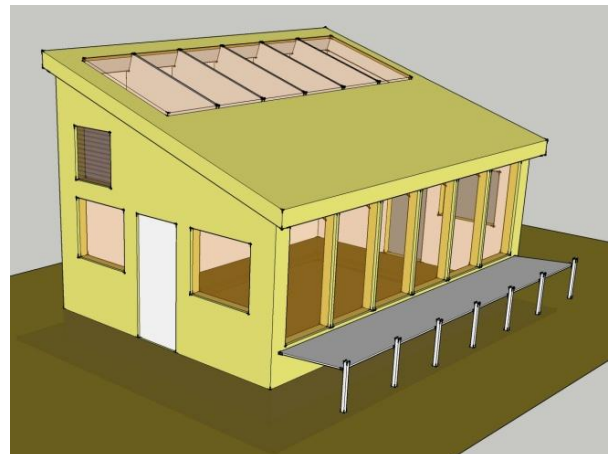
Southwest elevation. The space below the roof between the lower edge of the roof fenestration and the south wall houses automated sliding shutters that raise the insulating value of the window areas to R-12 + at night or other times as needed. The rooftop can also accommodate photovoltaic or solar thermal collectors.
